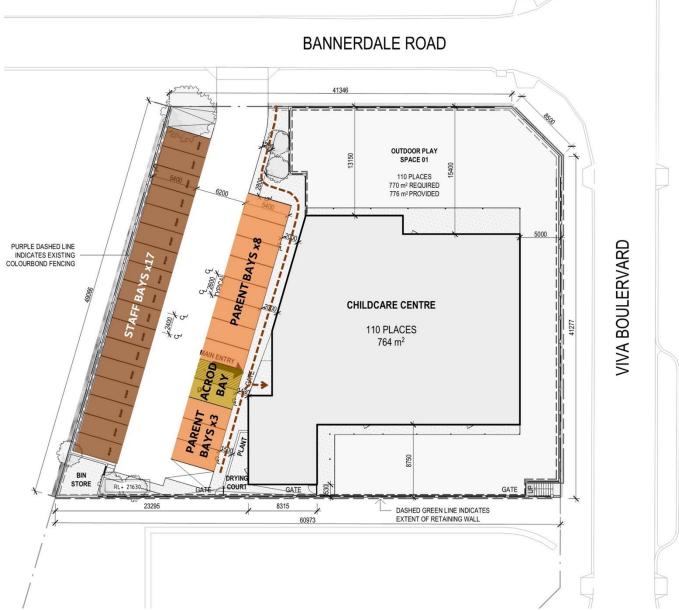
Proposed parking bay allocation for the Baldivis Childcare Centre (base plan source: Brown Falconer Architects, 2022)
